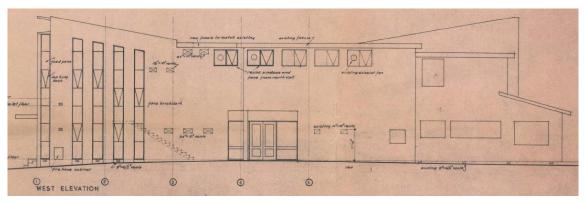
Drawing related to building permit 4609. Proposed west elevation (K Popper, Nov. 1972) (Source: Council Building File)
